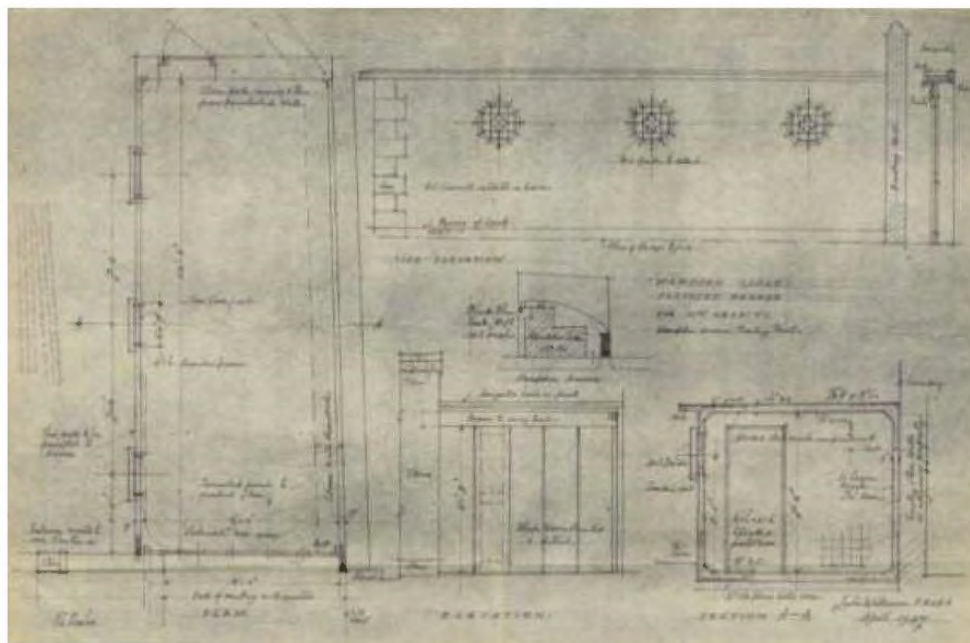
Plans from BA55/1947 (Source: Woollahra Records)
